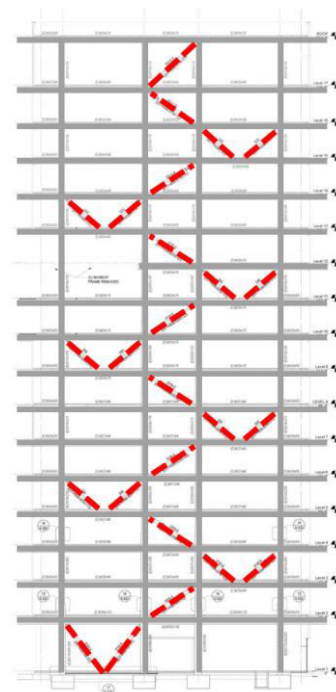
651 Gateway elevation with finalized damper layout (in red)
